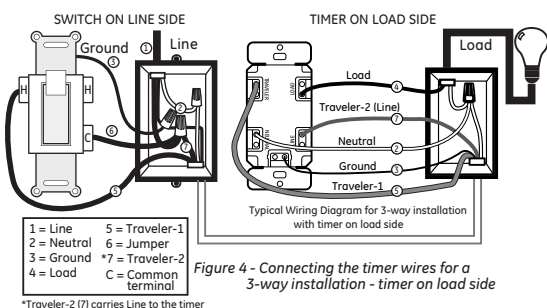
Connecting the timer wires for a 3-way installation - timer on load side
